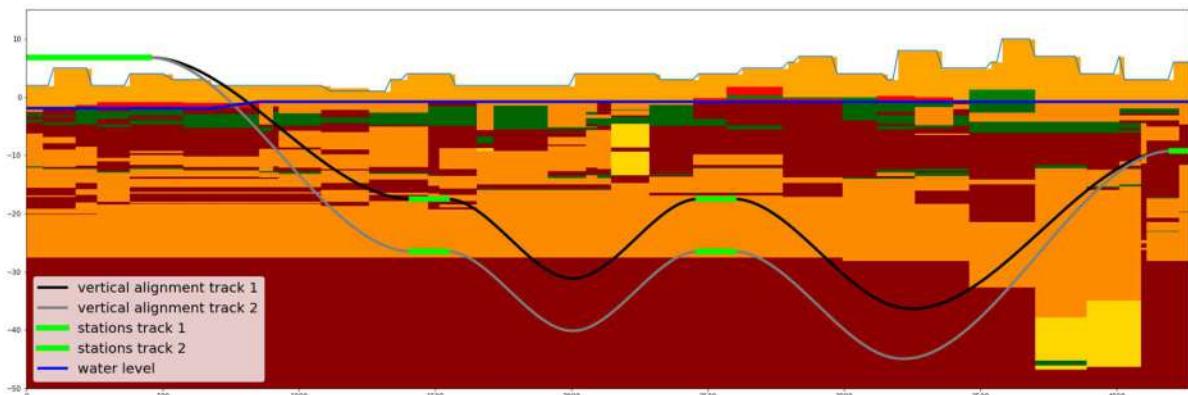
Soil profile at Haven-Stad, below station Haven-Stad there is only clay (red).
